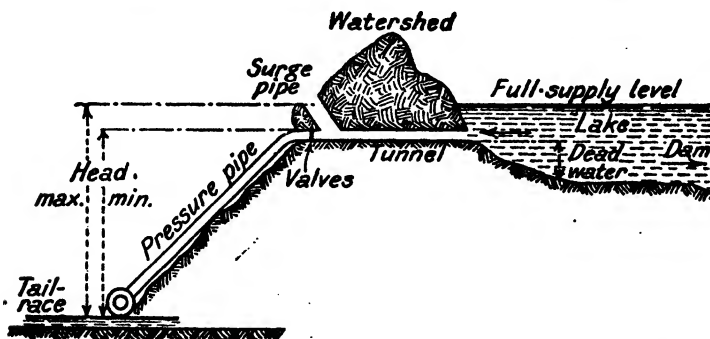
(i).—Section showing lake with water-shed, tunnel and surge tower.
